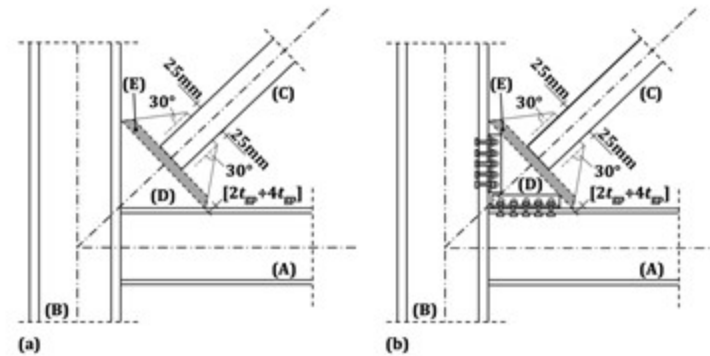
Configurations of gusset plate connections for out-of-plane buckling: a) welded connection; (b) bolted connection; (b) bolted connection; (A) beam; (B) column; (C) diagonal brace; (D) gusset plate; (E) linear clearance
